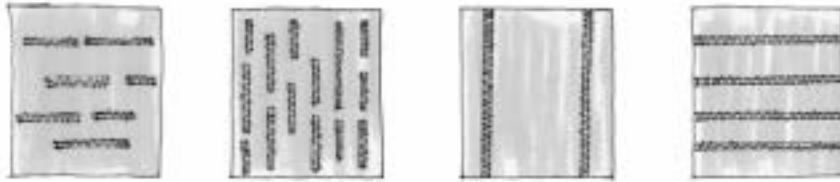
Sketches of various arrangements of ventilation openings in a façade. Keywords here are composition, proportion, scale, and rhythm.
